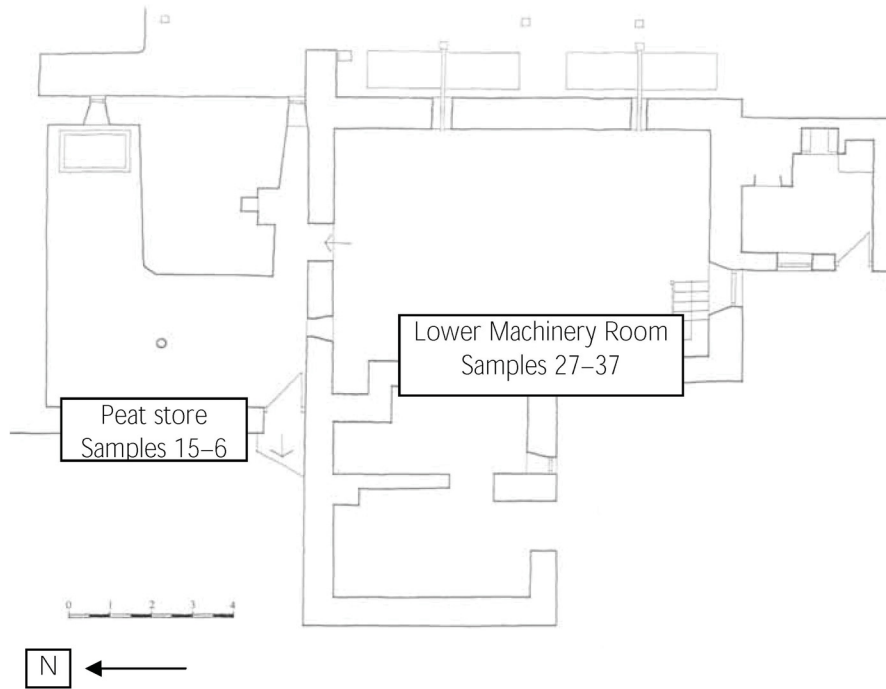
Eskdale Mill, Boot. Ground-floor plan. Drawing with permission from David King, Eskdale Mill and Heritage Trust
